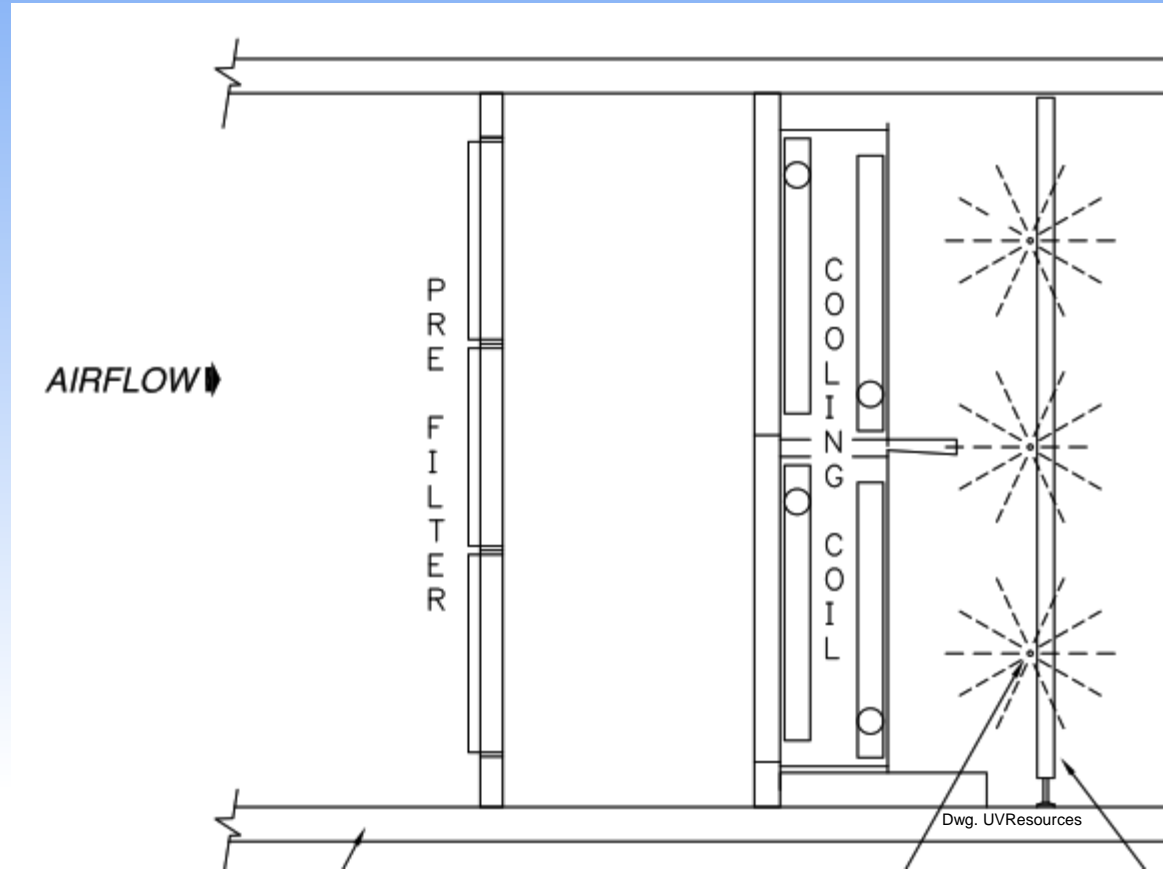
Section View of Typical HVAC Surface Treatment Installations
